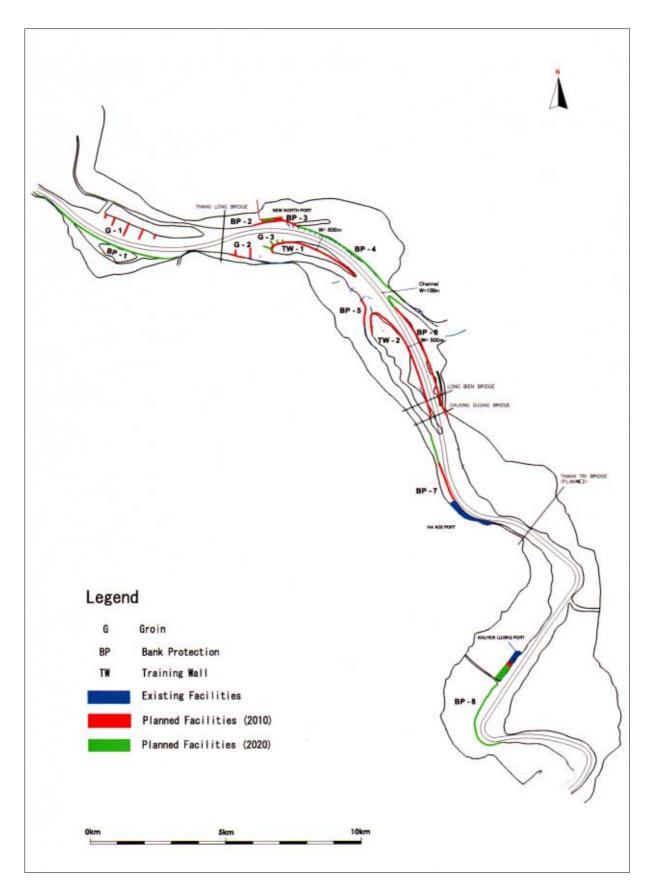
Proposed Alignment of Channel Stabilization Facilities
